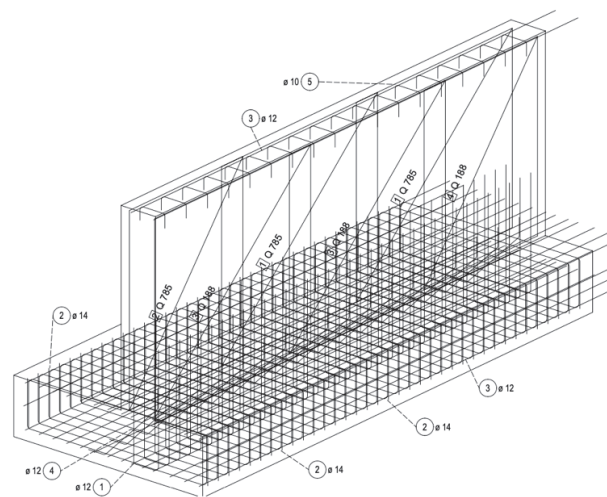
3D BIM model of reinforcement plan of the concrete pile cap and wall of zone I for landslide Laz 18 created in Allplan (Allplan Nemetscheck Group GmbH 2020).
